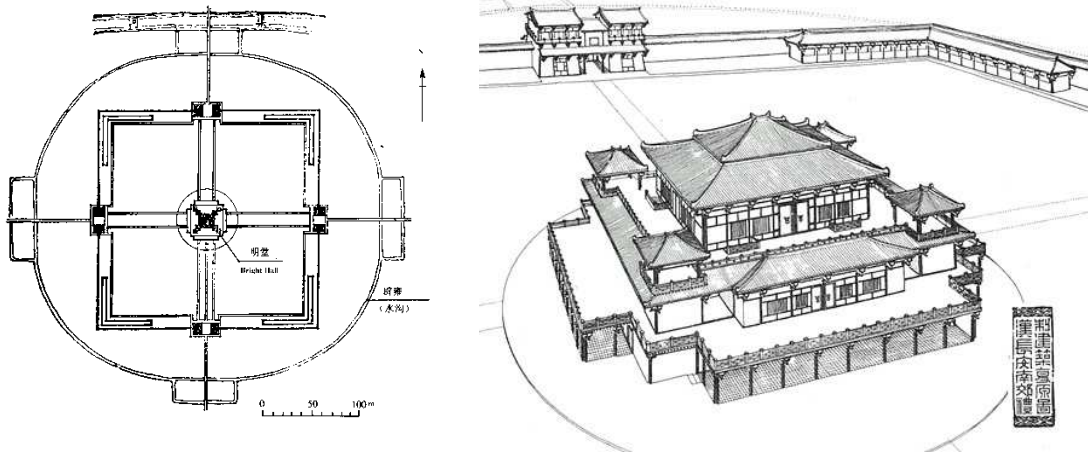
Plan and Reconstruction of Bright Hall of Wang Mang. 9-23 CE. Xi'an, Shaanxi Province.
